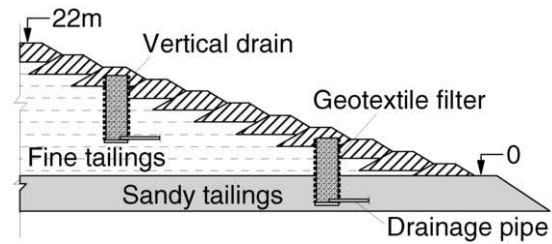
Section of Germano Dam showing Drying bays (Beirigo et al 2009)
